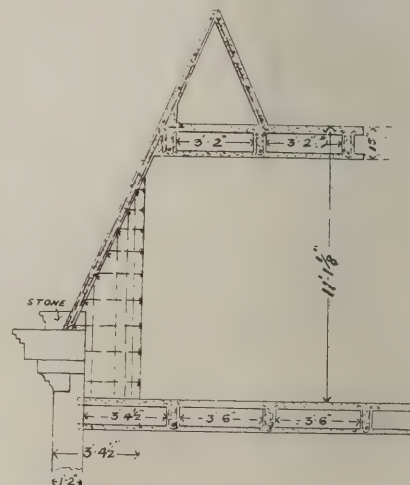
COMBINED MANSARD AND FLAT ROOF IN REINFORCED CONCRETE, NEW YORK.
